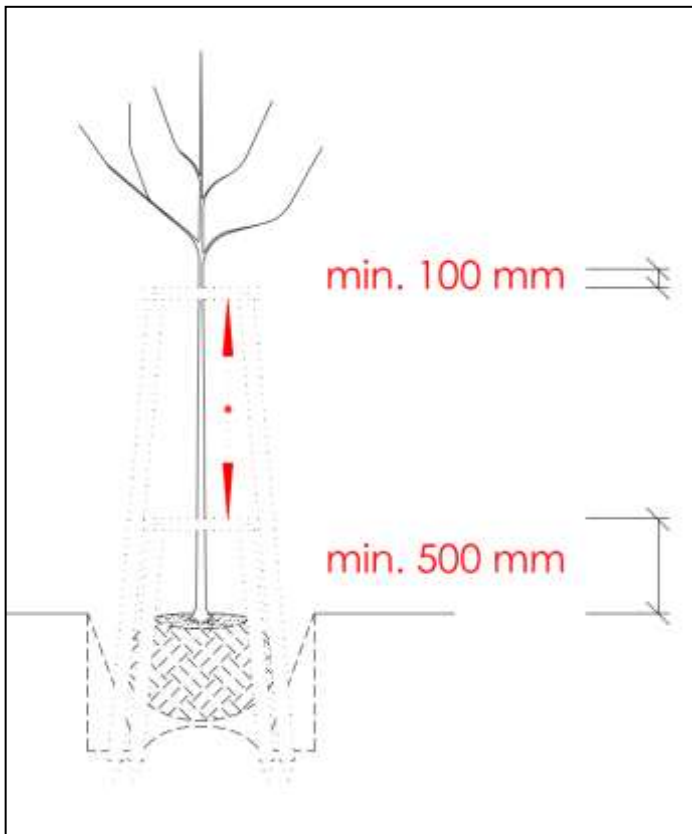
Tree planting and anchoring dimensions (4.8.8).
